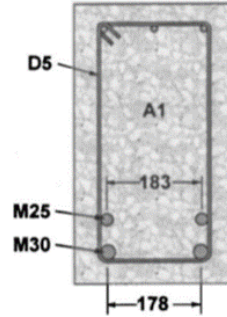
Cross-section of beam A1 (from Vecchio and Shim (2004))
